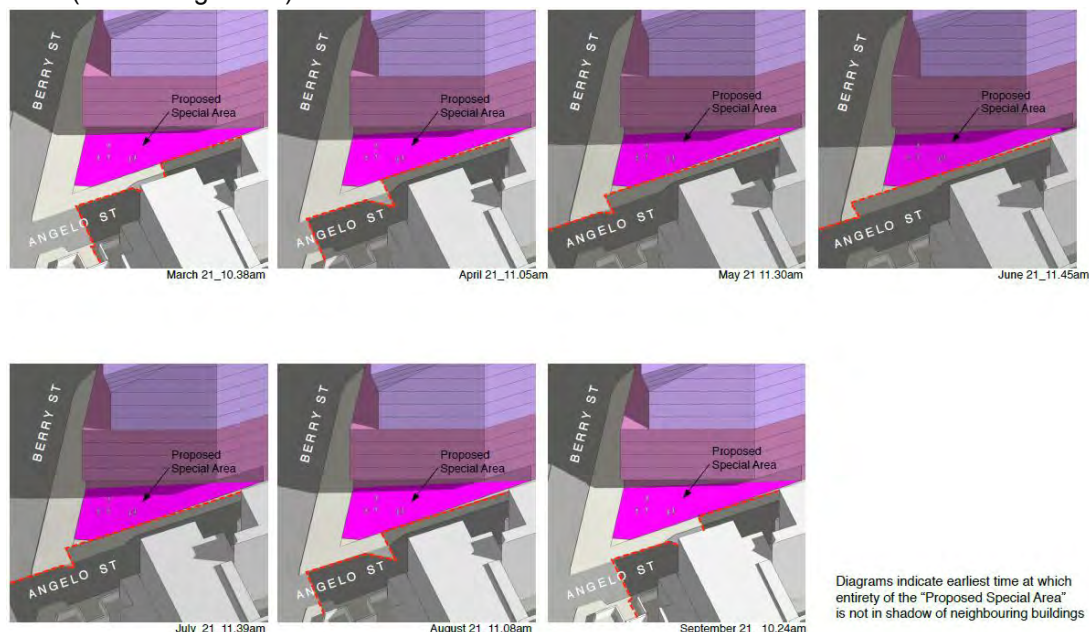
Proposed solar access to new “special area” (Source: Turner)
